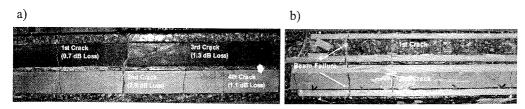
Final location and size of cracks: a) on beam A, b) on beam B
